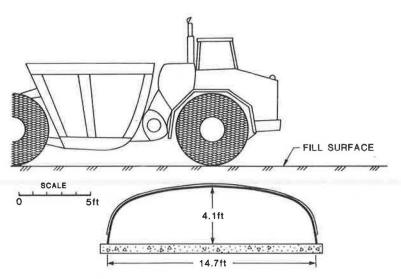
Schematic cross-section of the Rancho box culvert showing critical vehicle loading at the time of failure.
